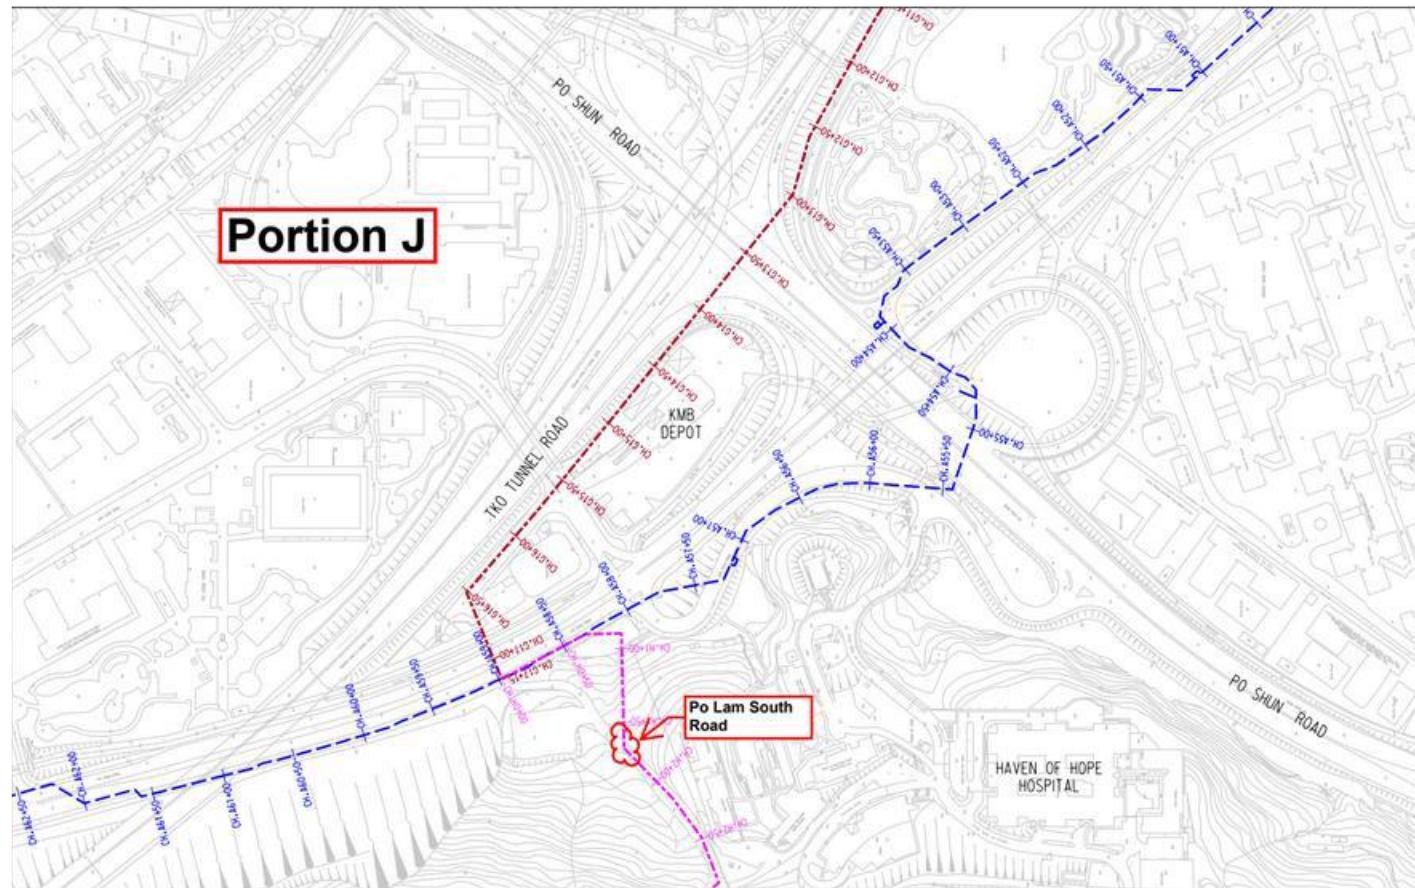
Location Plan for Portion J - Mau Wu Tsai 1 (Po Lam South Road 1)
